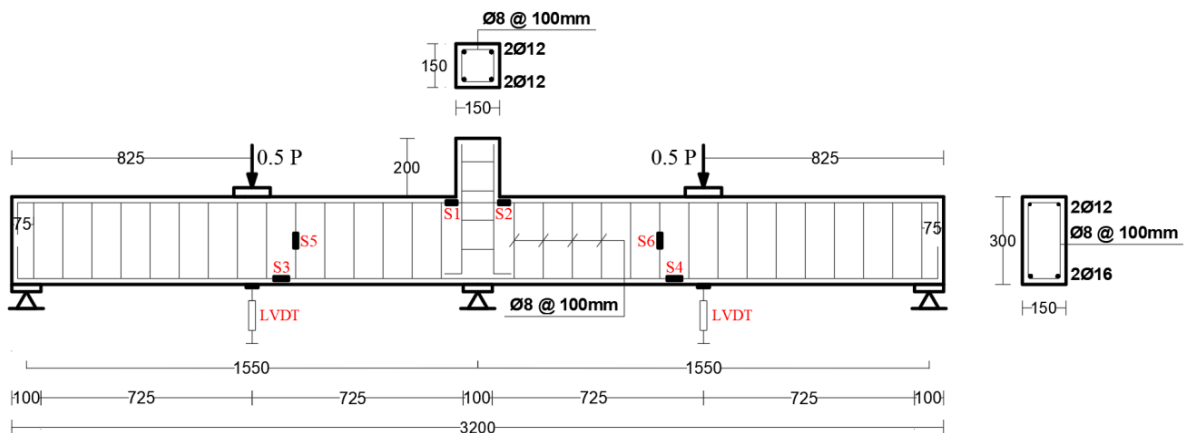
Geometry and reinforcement details of continuous RC beams (all dimensions in mm).
